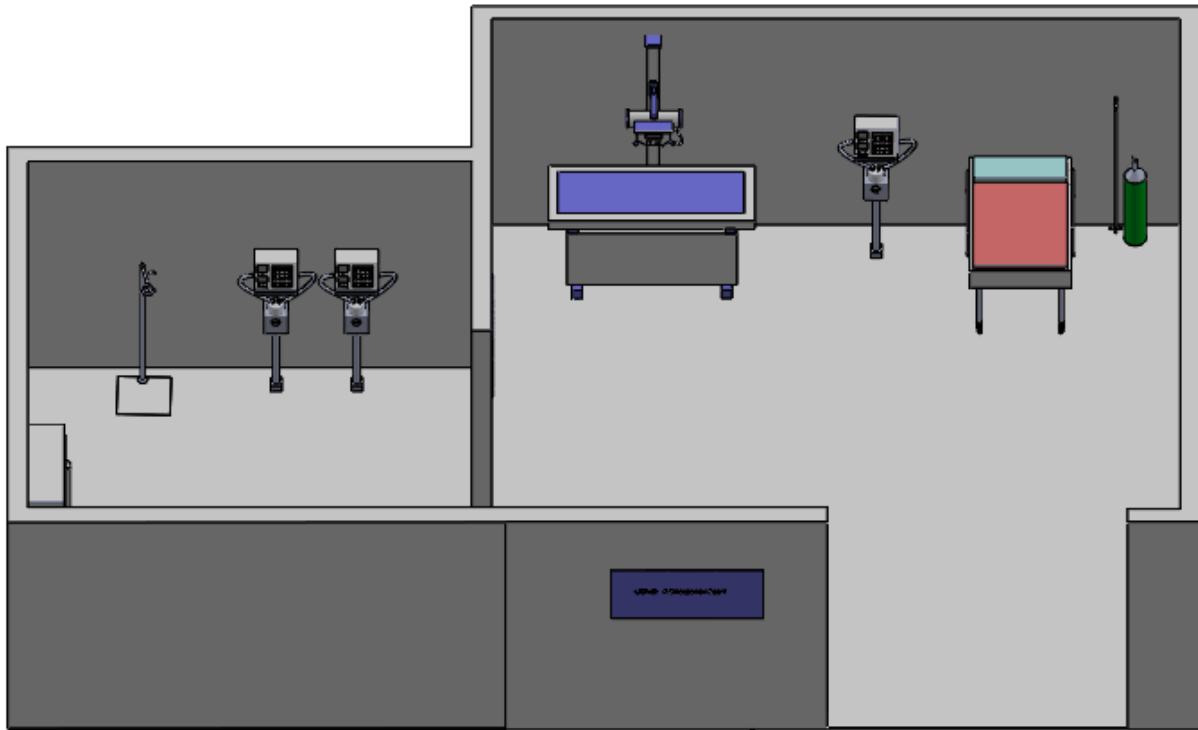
This design includes technology such as an X-ray machine, oxygen, and ventilator for COVID-19 patients. The back room contains additional equipment. Designed by Alejandra Escobar and Kiara Chinchay.
